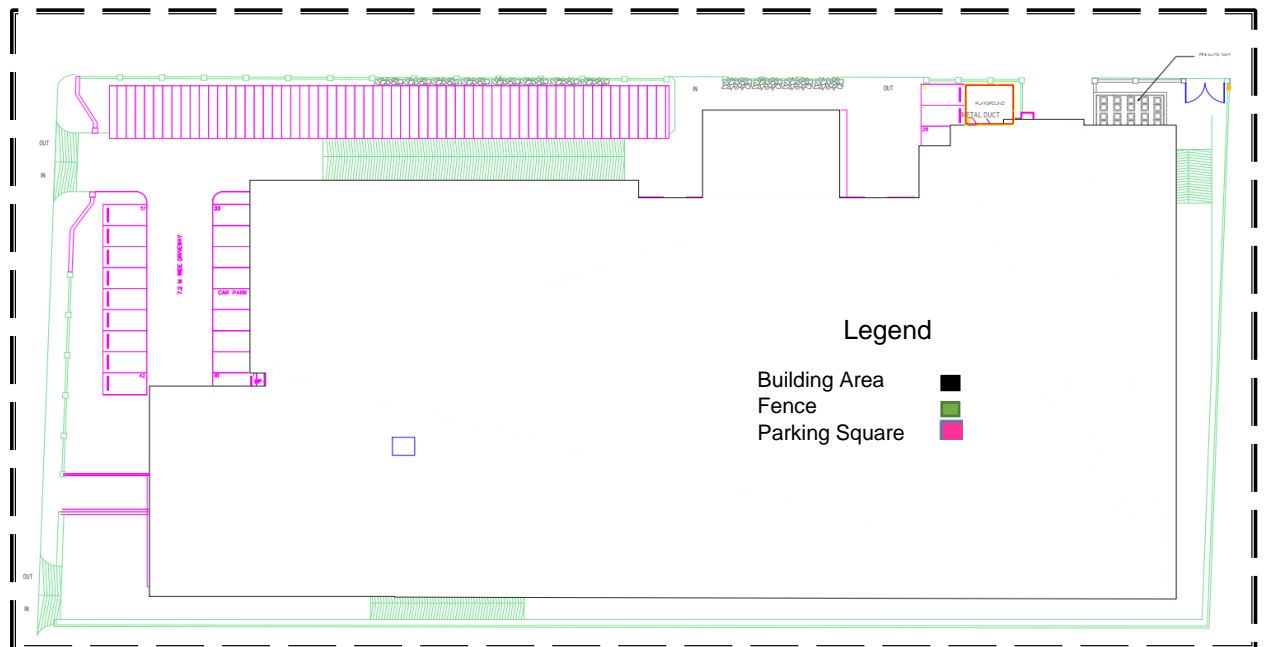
Site layout plan (Clear figure in Appendix-1)
